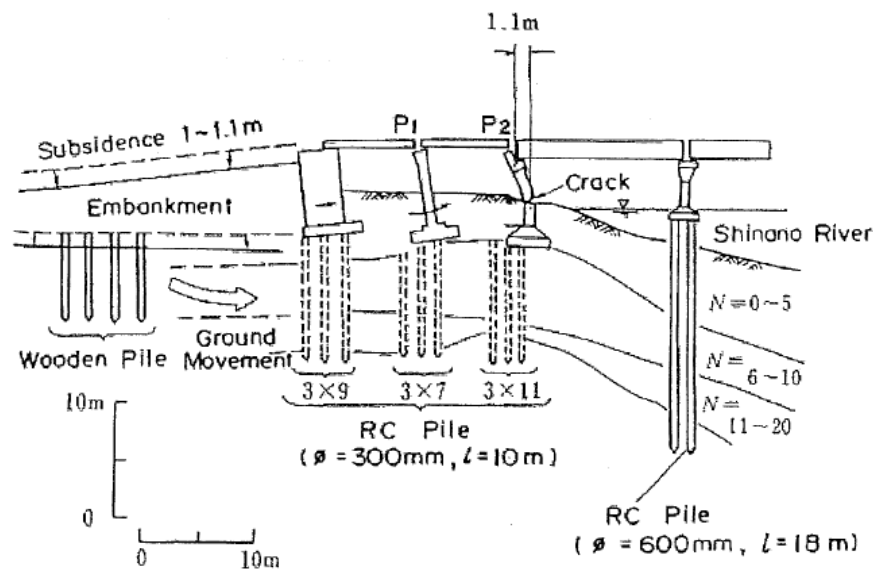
Damage to the Abutments and Piers of Yachiyo Bridge on the Left Bank (Hamada, 1992)
